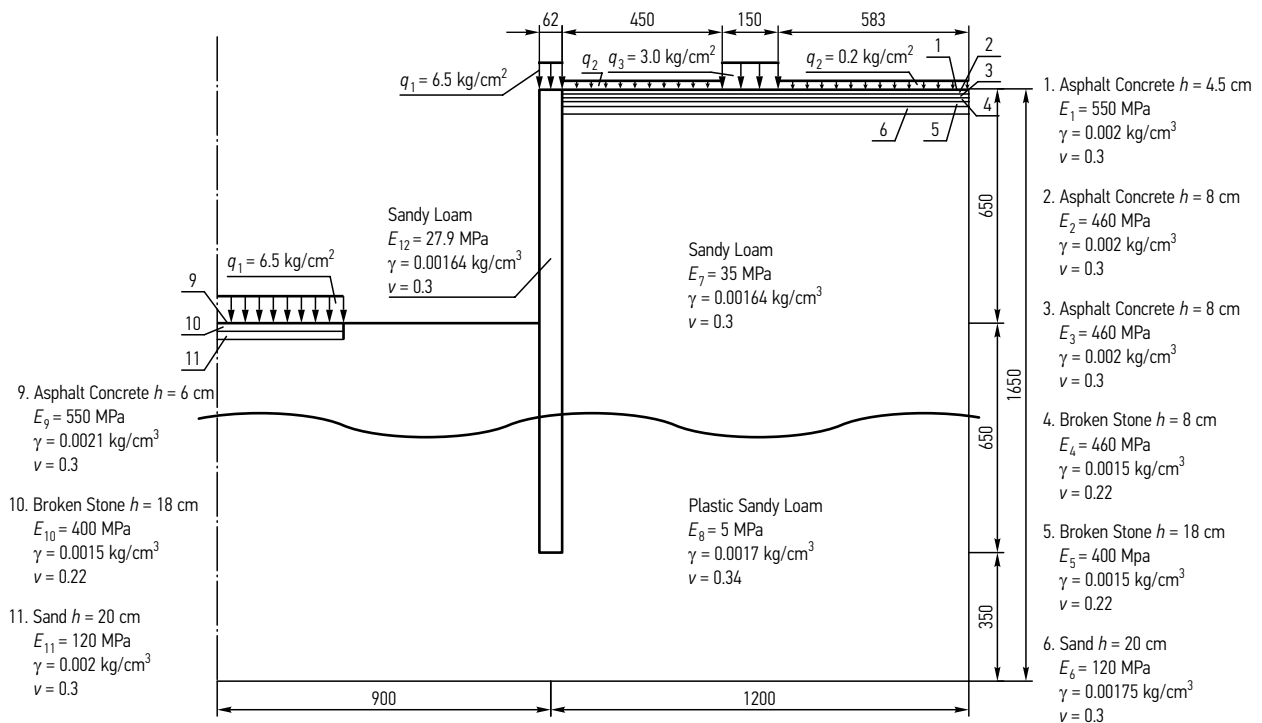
The constructive scheme of the overpass retaining structures with the soil basis interaction
